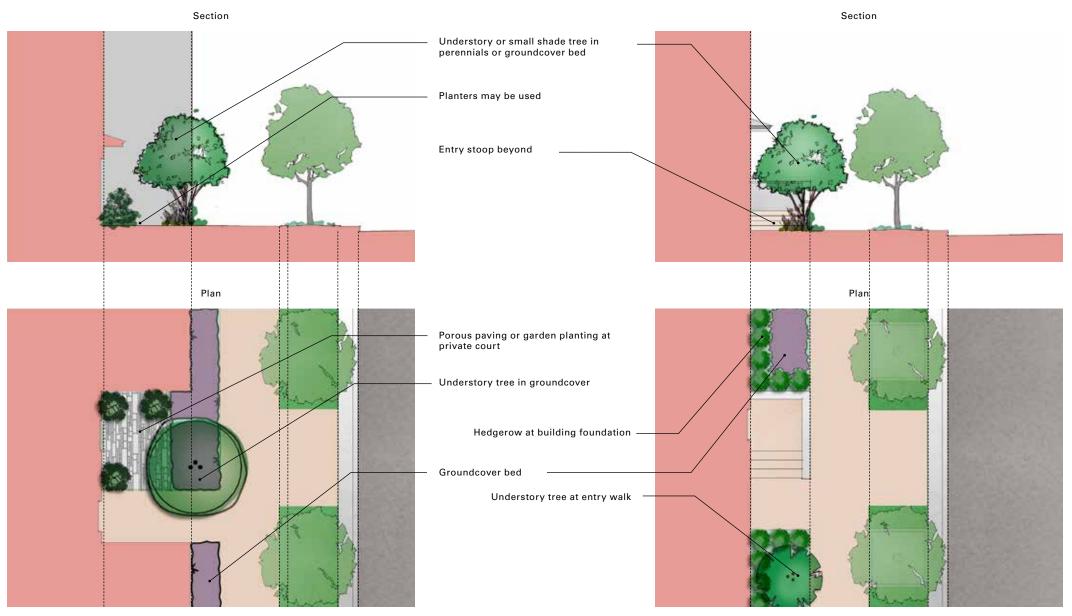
Typical residential frontage with forecourt showing proposed planting in plan and elevation
